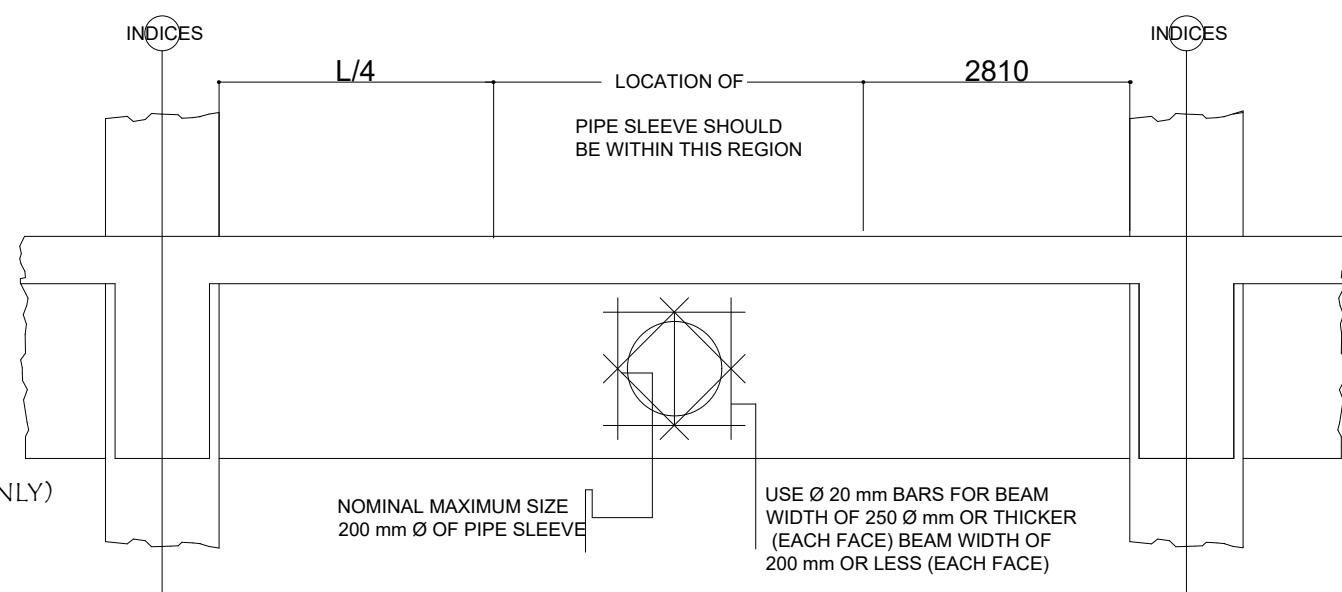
TYPICAL PIPE SLEEVE DETAIL
